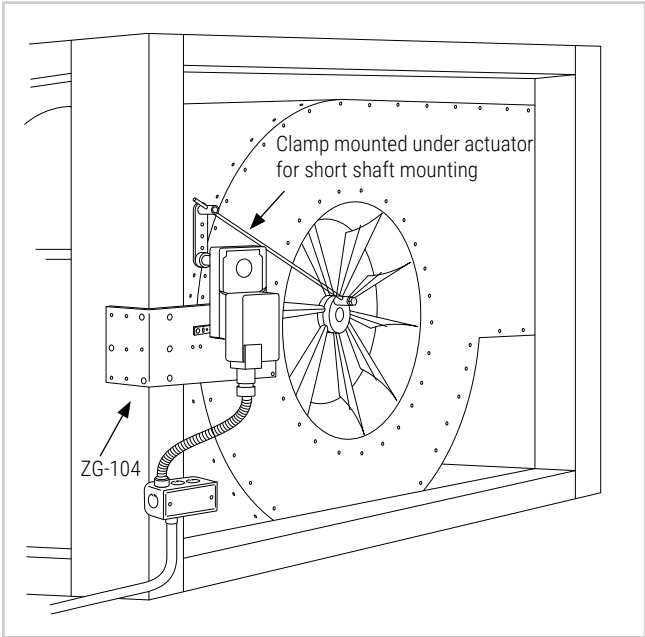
Actuator is mounted to the ZG-104 universal mounting bracket or a field fabricated bracket and connected to the inlet vanes with the crank arm kit
